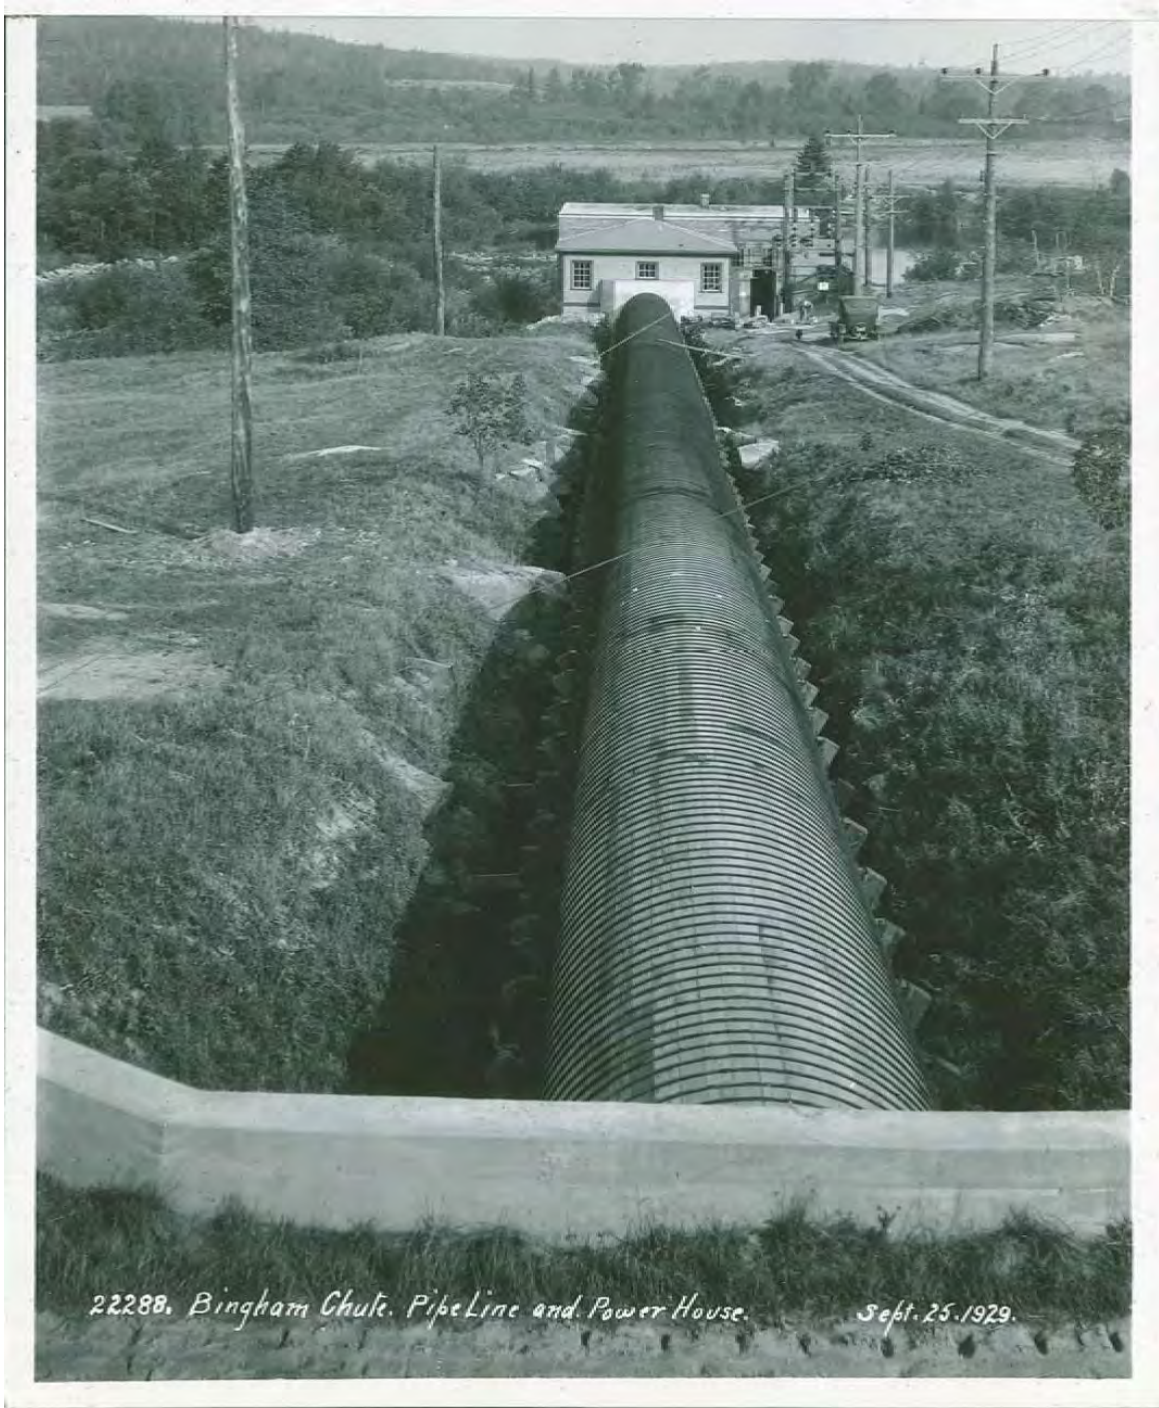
Early photograph of Bingham Chute GS showing original wood frame shed addition to south wall. Note the wood stave penstock and wood penstock supports, all of which were replaced circa 1975. Refer also to Figure 7.
